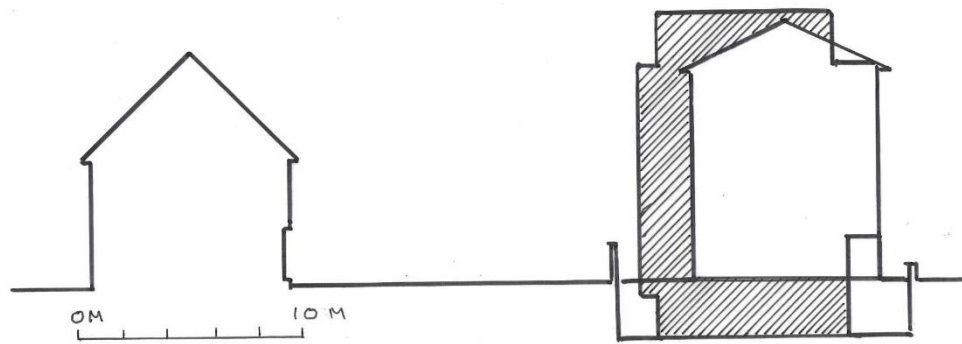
Section through the proposed development on the Lamorna site and Chetwynd Villas.
